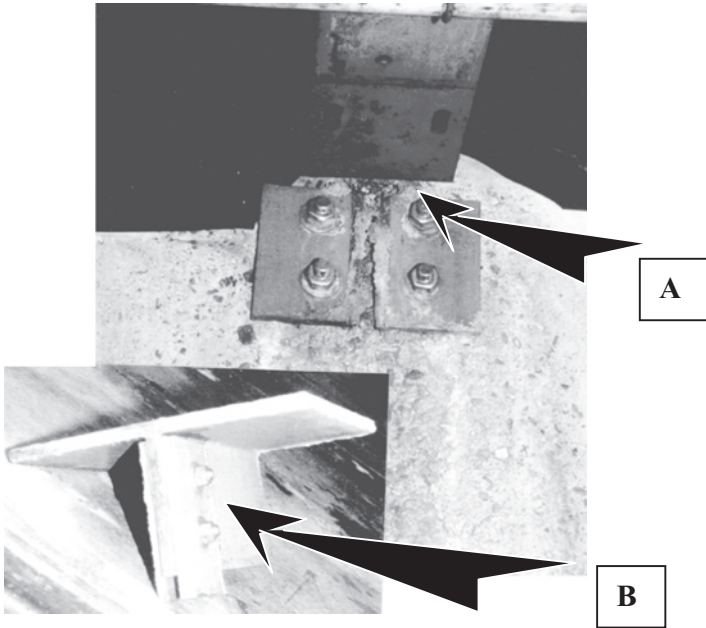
Typical failure of steel-like connection details (out-of-plane angle leg separated from the leg attached to concrete wall). A, The as-built position; B, position after separation failure.
